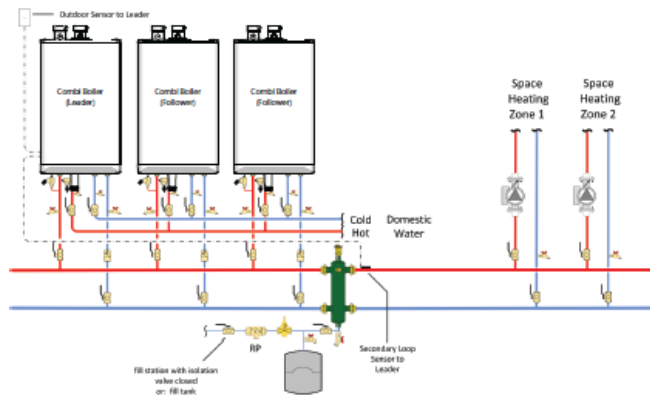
Typical Combi Boiler cascade piping – concept drawing. This drawing is only a simple schematic guide
